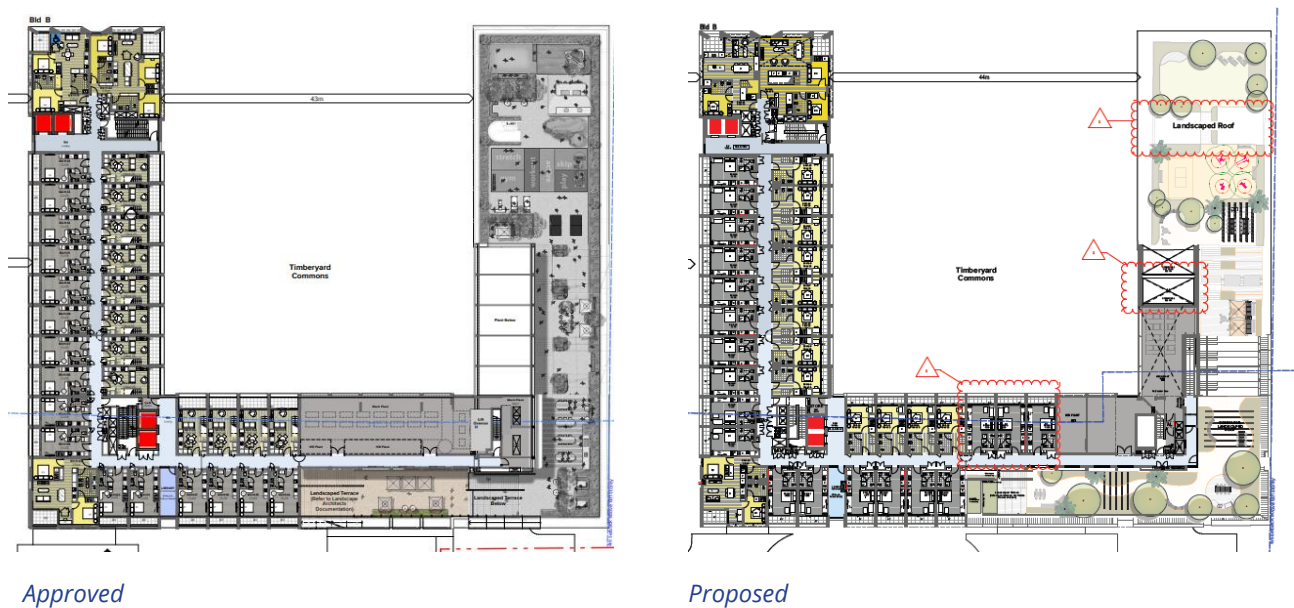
Comparison between approved and proposed Building B Level 11 layout
